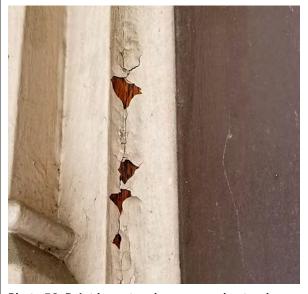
Paint loss at archway around entry door showing possible historic graining beneath.
